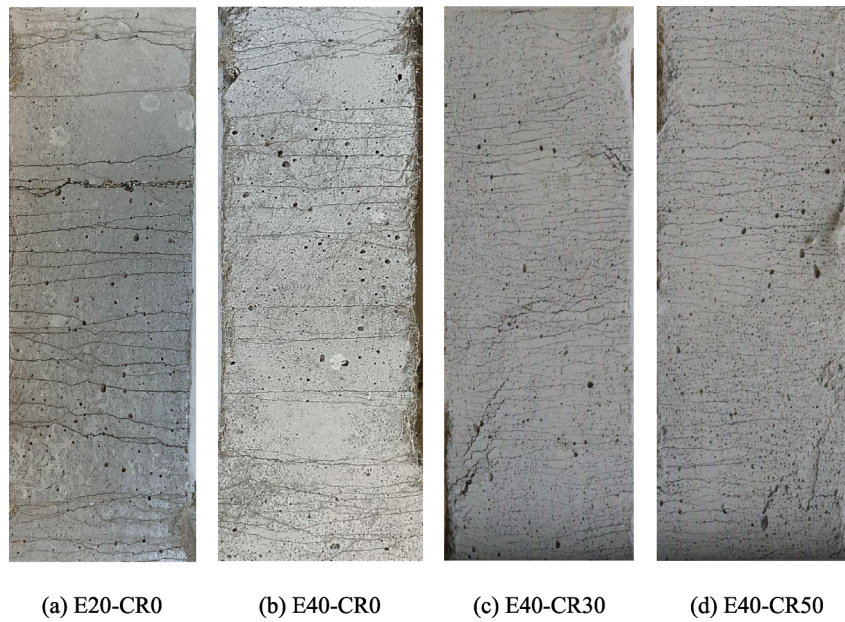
Crack pattern within the 80 mm gauge length of ECCs after tensile failure.
